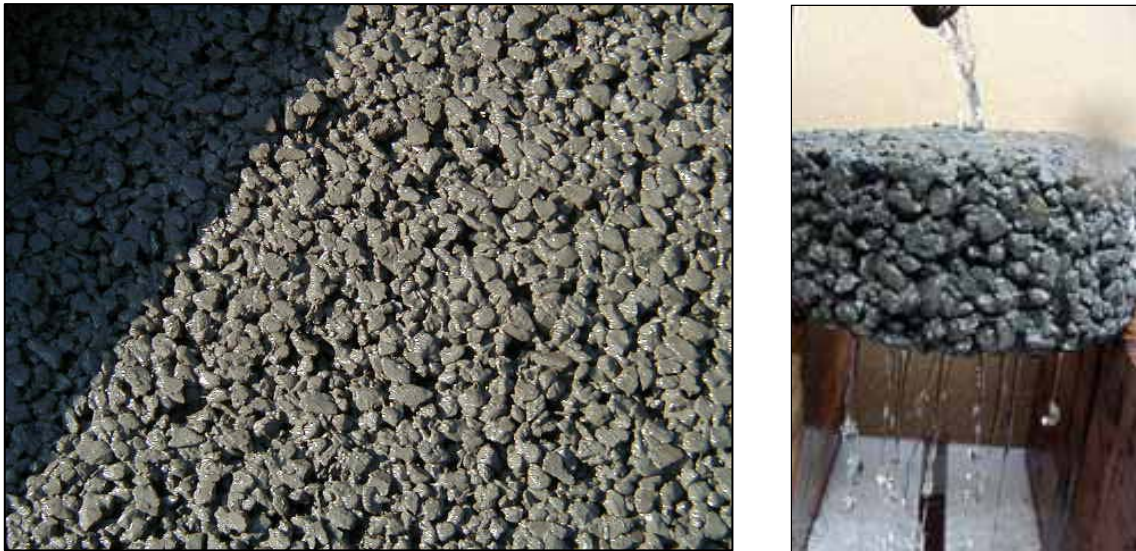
Pervious concrete pavement for parking lot and sample showing free draining of water
